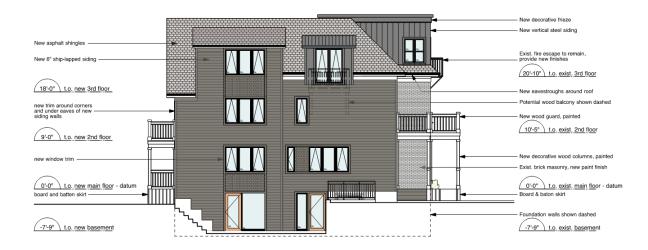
Proposed Rear Elevation (source: Architectural package submitted John McDonald Architects)
